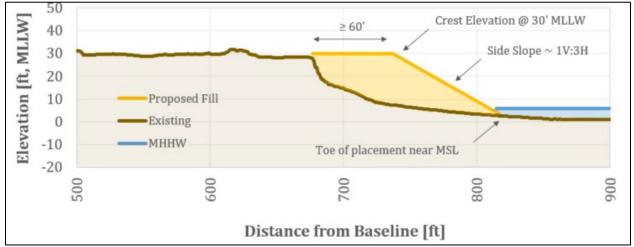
Example Cross-Section 93. (Plan View location shown in Figure 7)
